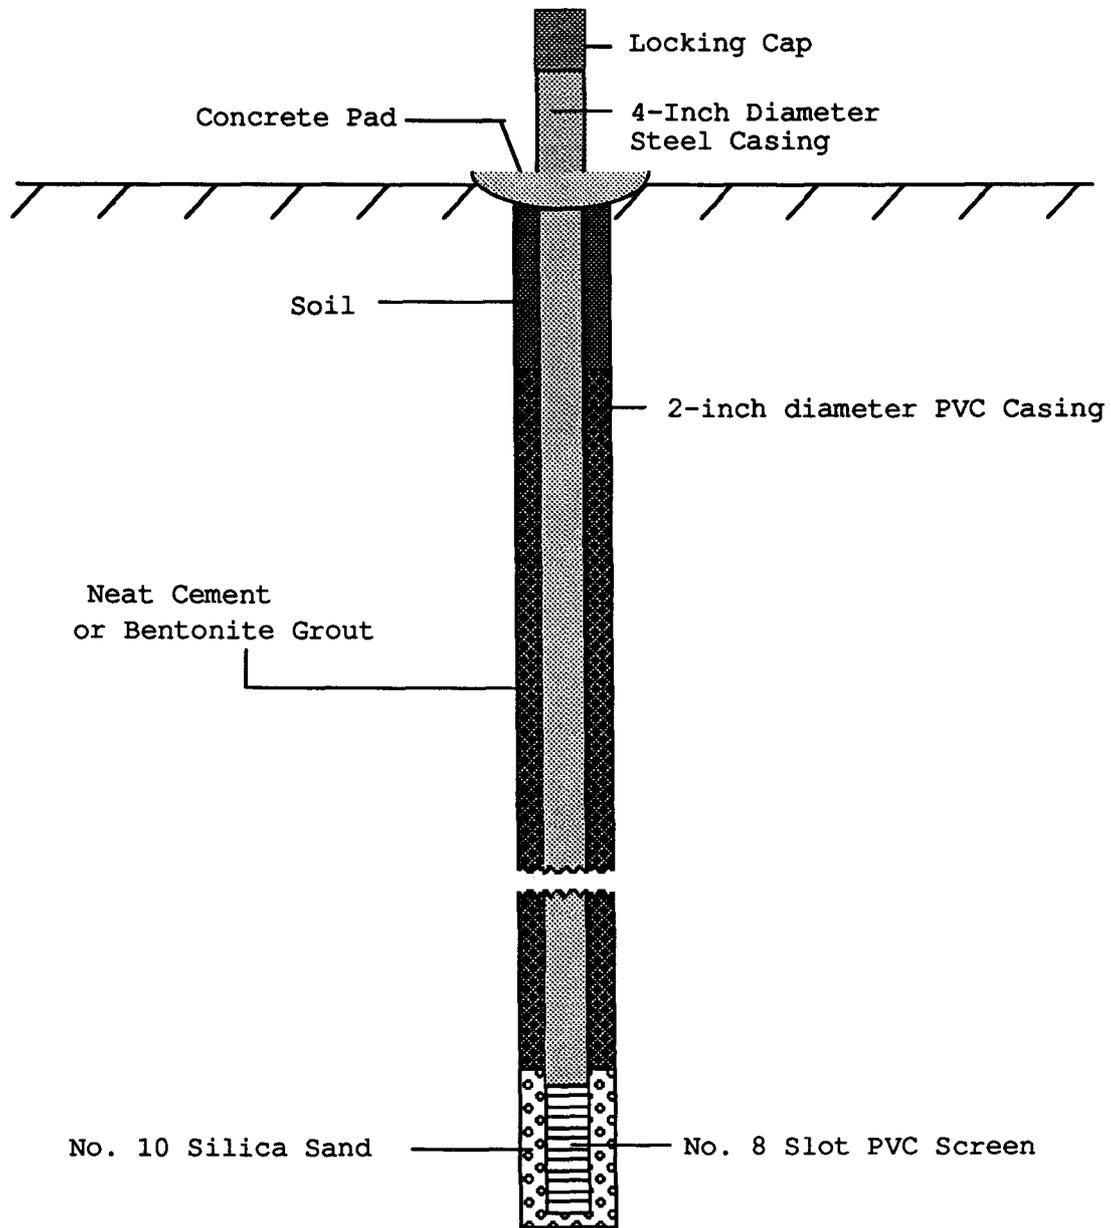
Construction design used for monitoring wells installed at the Minot municipal landfill.
